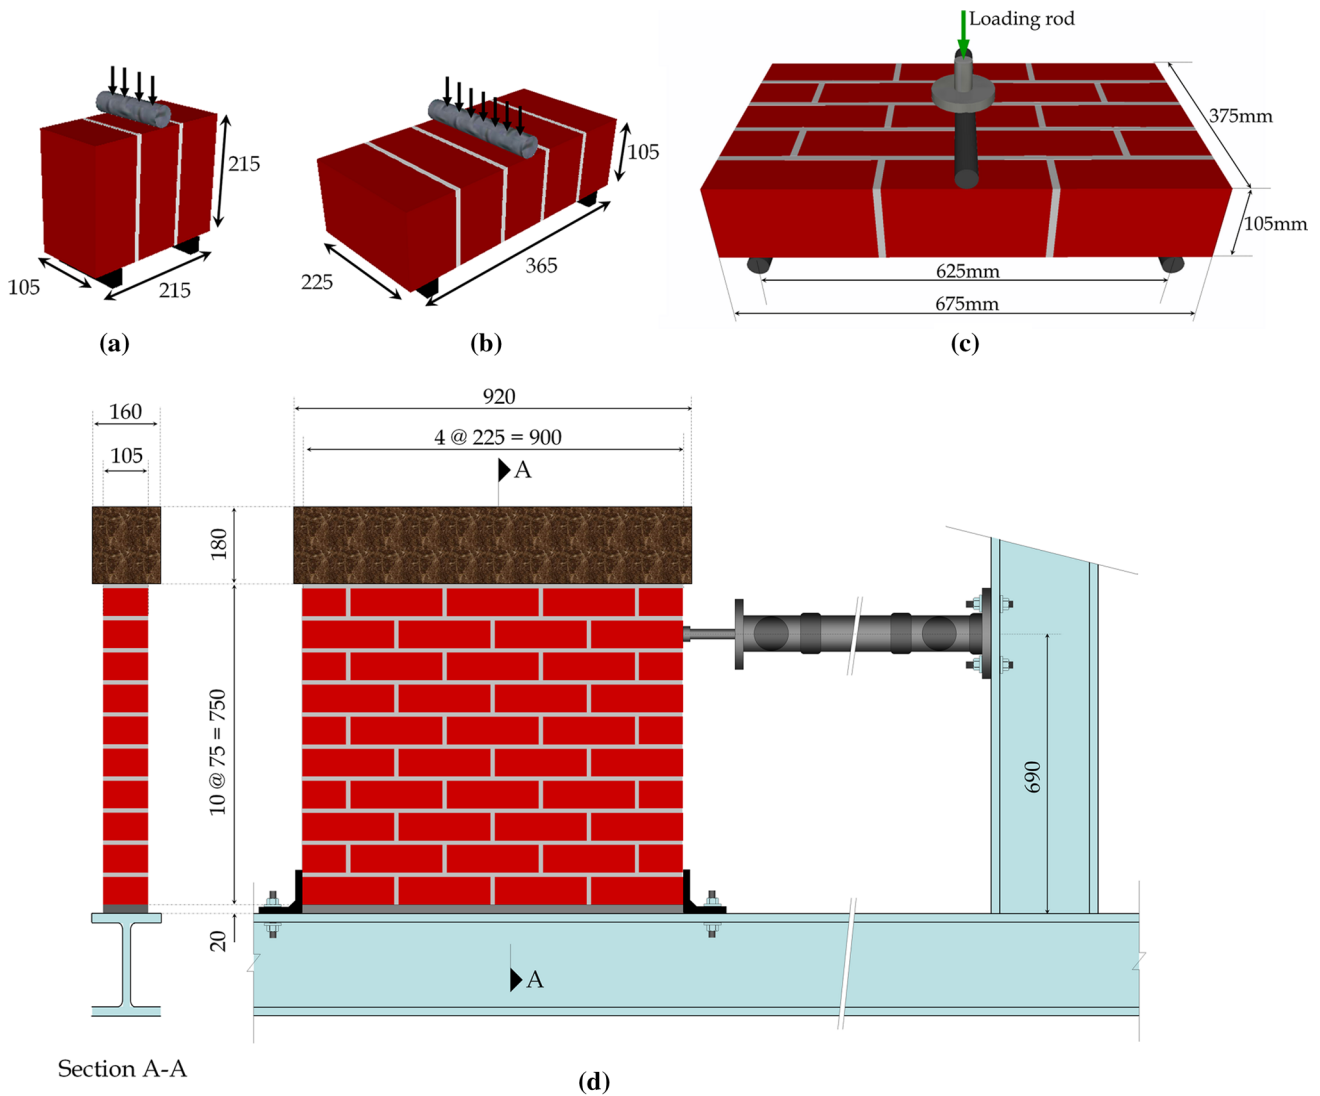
Layout of specimens used and test setup for a direct shear, b flexural bending, c out-of-plane and d in-plane shear
